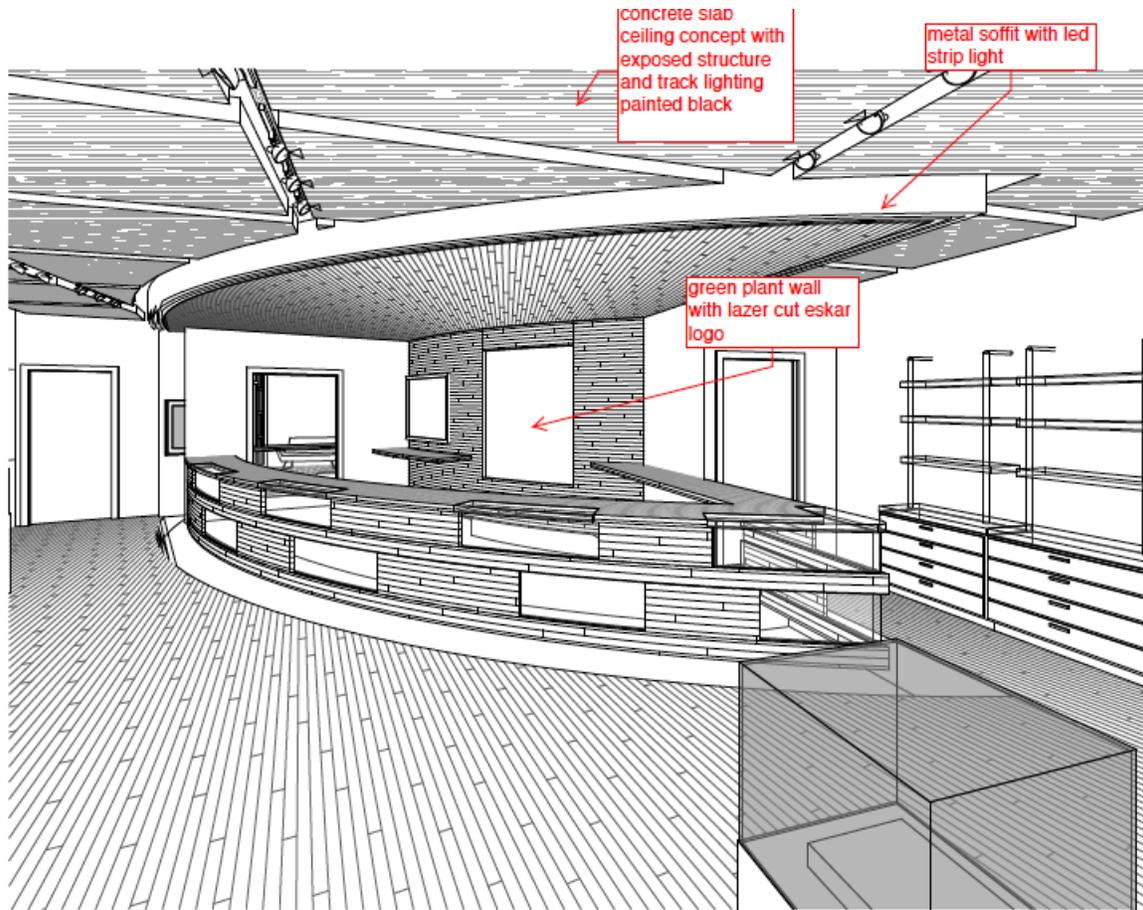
EXAMPLE OF STORE DESIGN. WOOD PANELING WILL COVER THE WALLS AND FLOOR GIVING THE STORE A MORE ORGANIC FEEL. THE CEILING WILL BE A CONCRETE SLAB DESIGN WHICH COMPLIMENTS THE WOOD PANELING.
